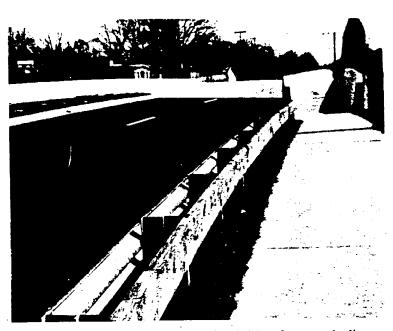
Protective rail on the backside of a guardrail adjacent to the sidewalk.
